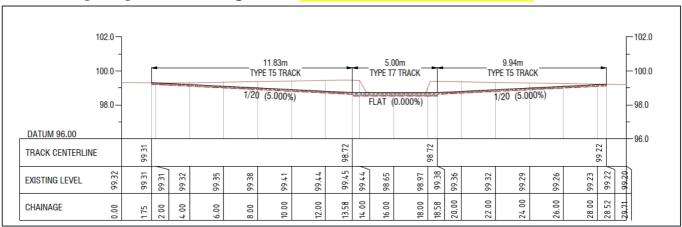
Cross-sectional view of typical detail for rock crossing design
